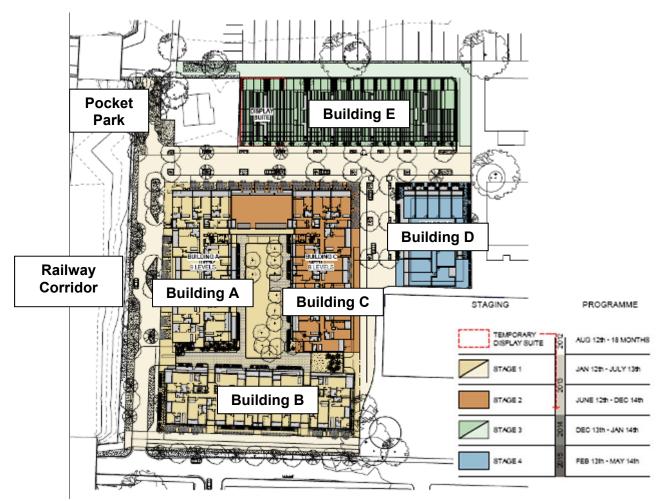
Proposed subdivision pattern and staging plan. Buildings A, B and C (detailed design) are the subject of this application. Buildings D and E are subject to future development applications.
